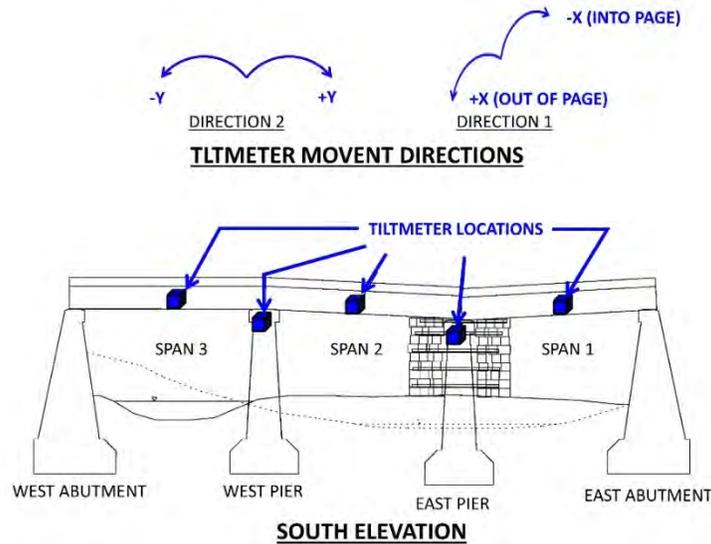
Placement of Tiltmeters on South Side of Bridge. North Side Similar.
